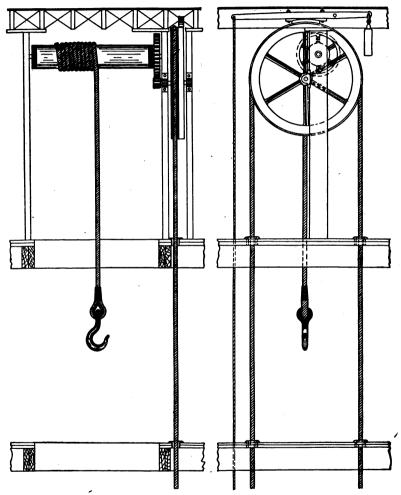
Front and Side Elevation of Sling Type of Hand Elevator
